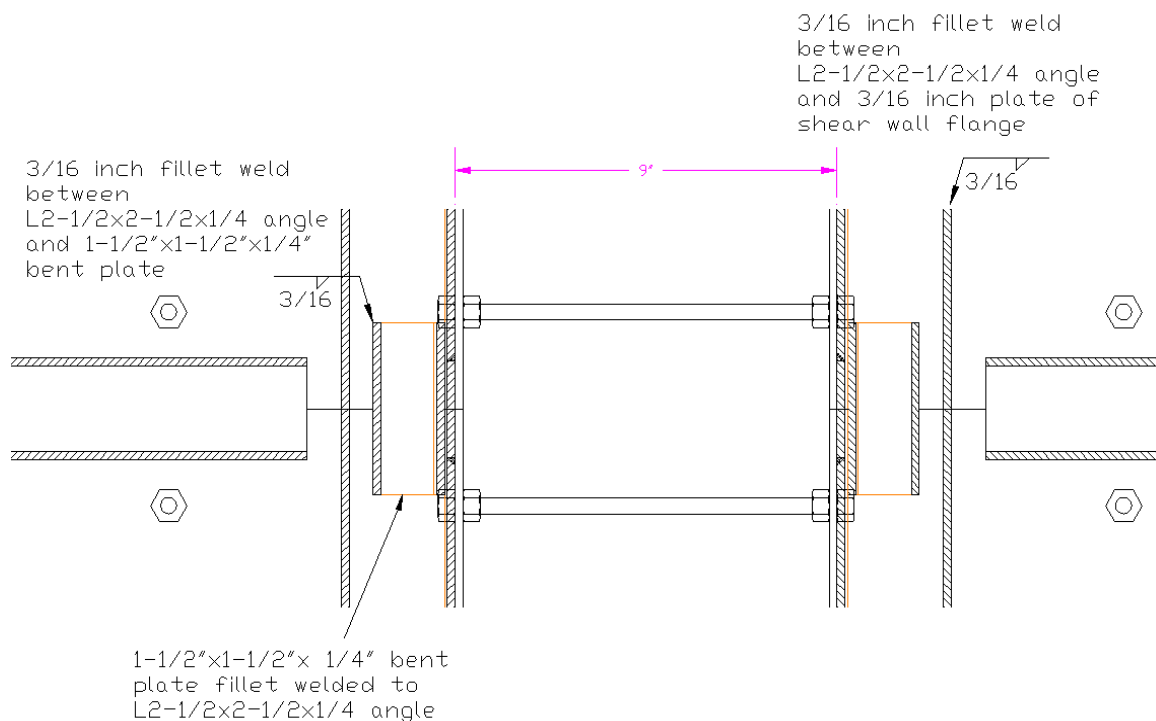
Joint details at intersection between 2nd and 3rd Story – Front view
